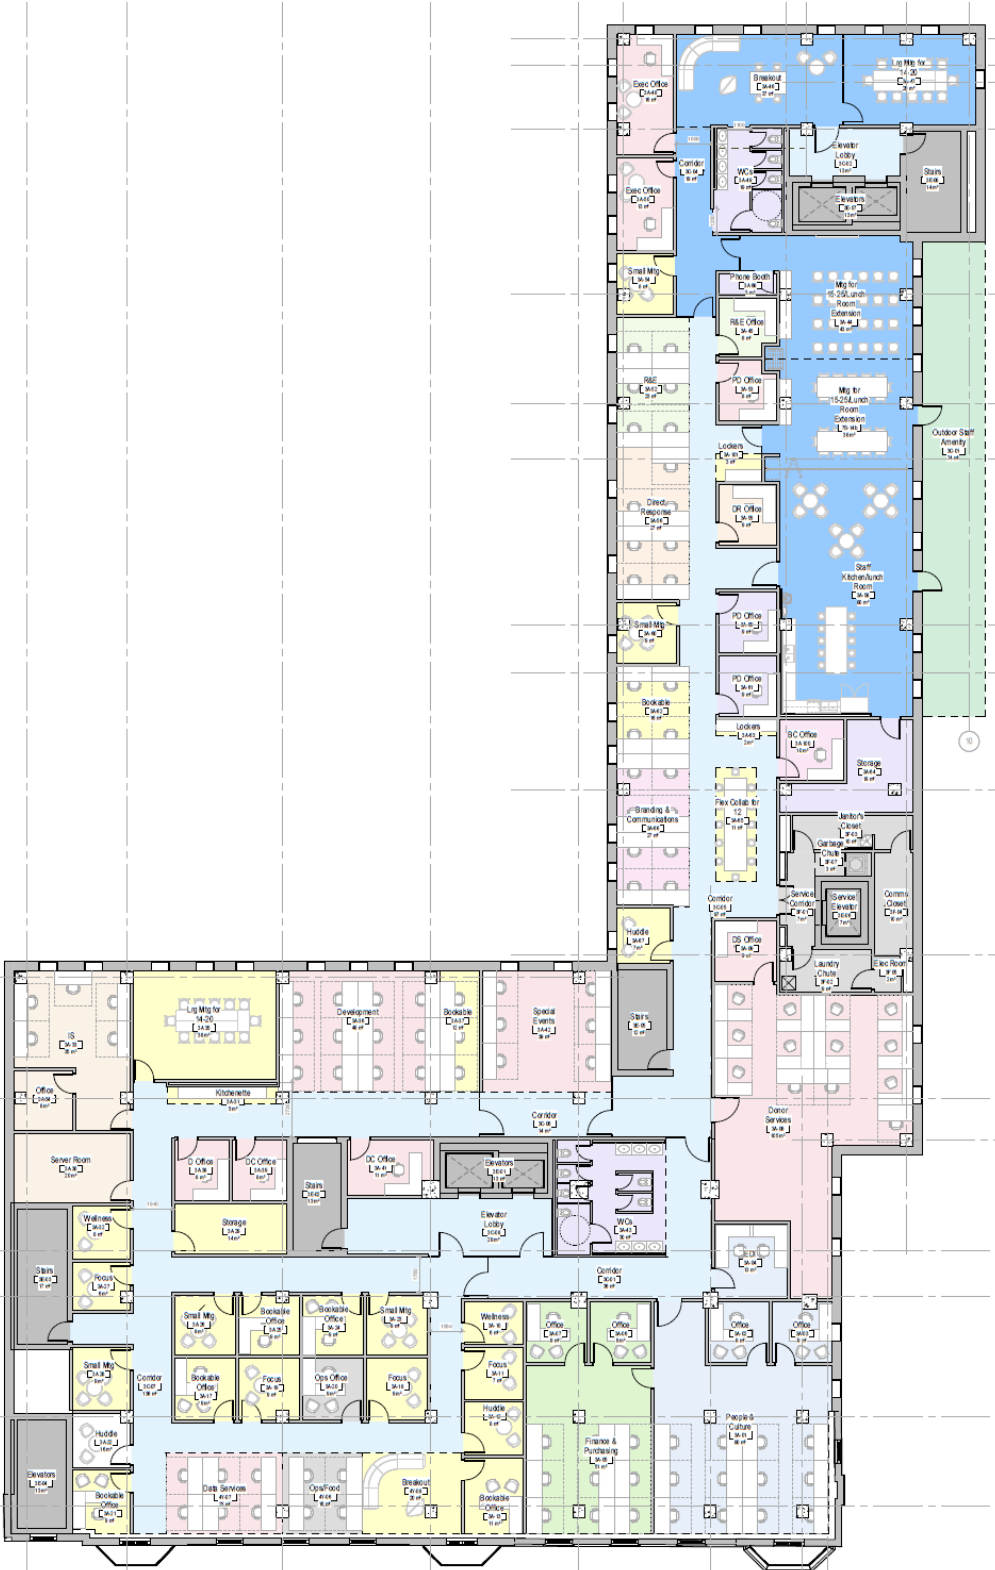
Level 3 floor plan for 20 Gerrard Street East included for illustration purposes (ERA Architects Inc. & Hilditch Architects Inc., March 3, 2026).
